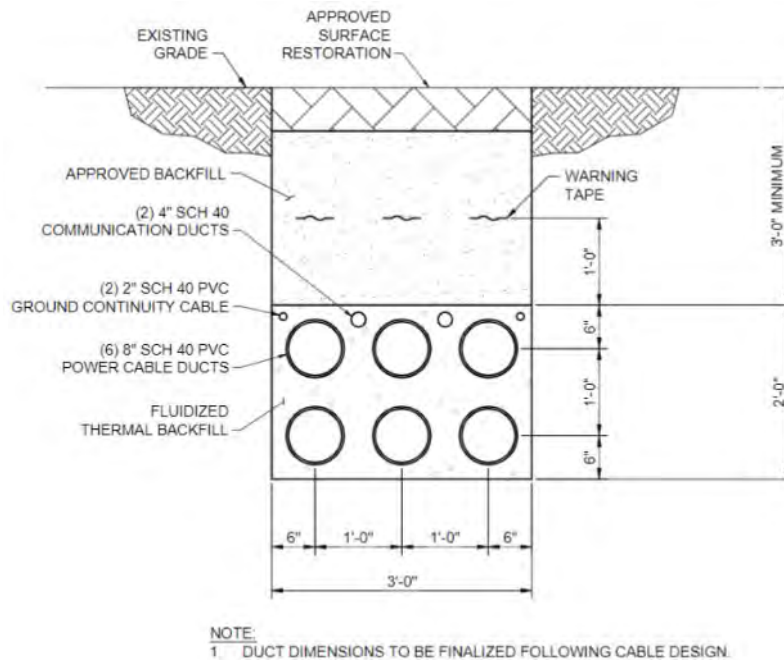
Typical Installation Configuration of Underground Onshore Interconnection Circuit
